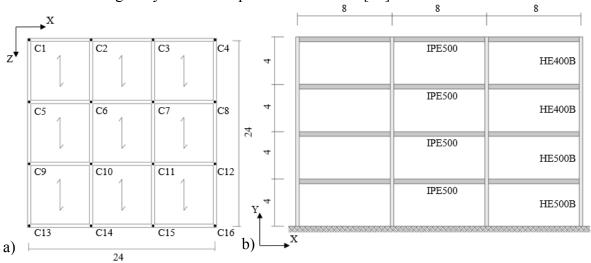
Existing steel MRF building: (a) plan view and (b) elevation view [8]
